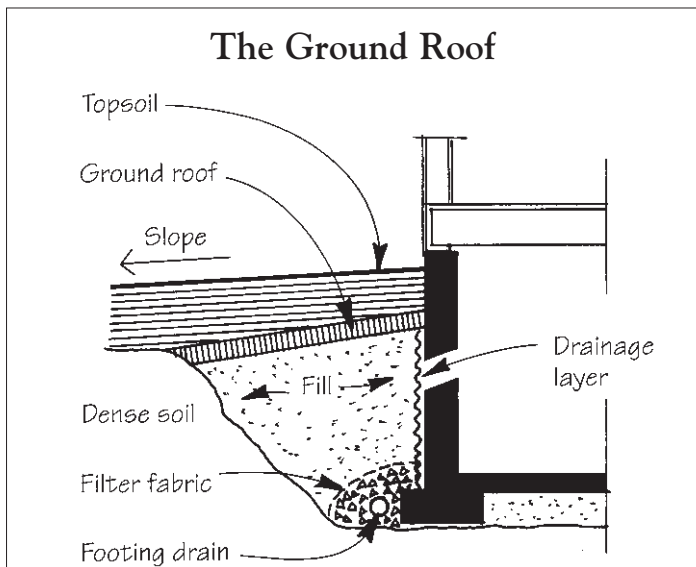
A ground roof is a sloping “canopy” of impervious clay or plastic sheeting that covers the foundation excavation and drainage system — especially useful for heavy soils where otherwise water would pond against the foundation.
